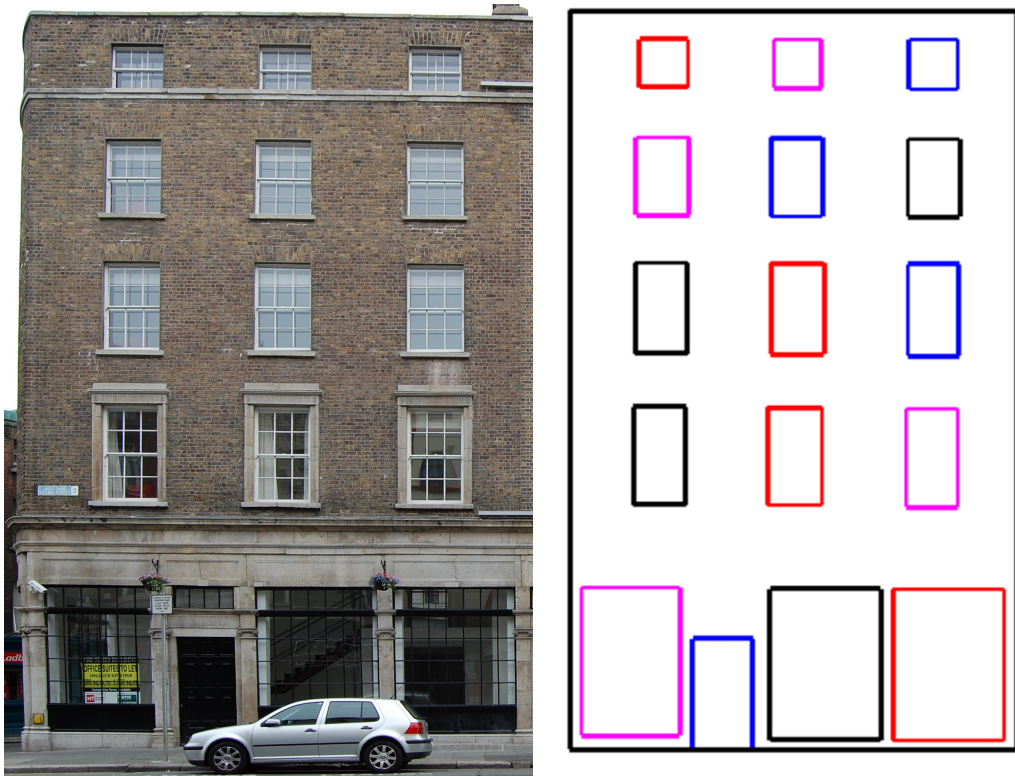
(a) D'Olier street façade and (b) Resulting building reconstruction from the proposed method, with evidence of occlusion
